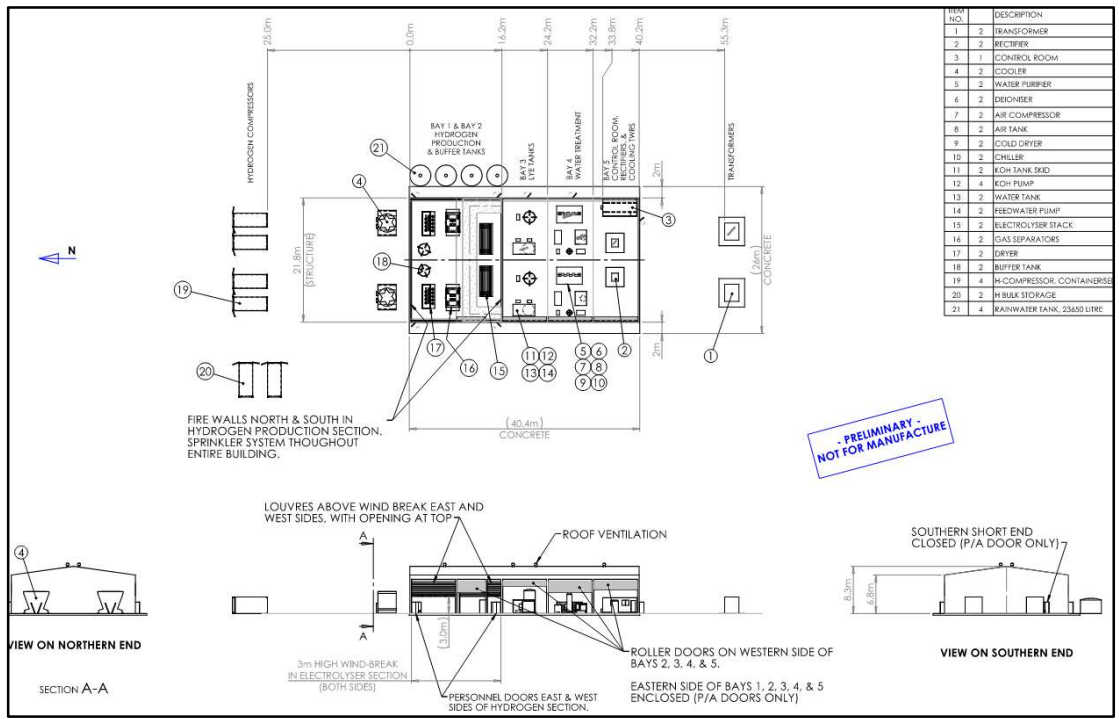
Proposed Electrolysis Plant - floor plan and elevations
